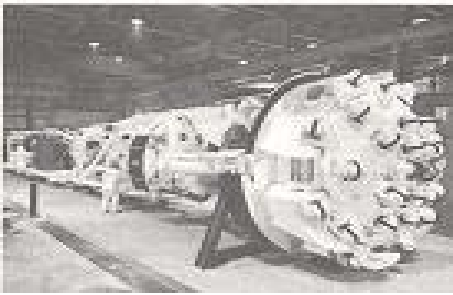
Robbins TBM . (Note that the machine head, i.e., the front part of the machine, contains the rotating cutters which bore through the rock to make a circular hole. The machine advances on legs, and is pushed forward by a hydraulic ram.)
